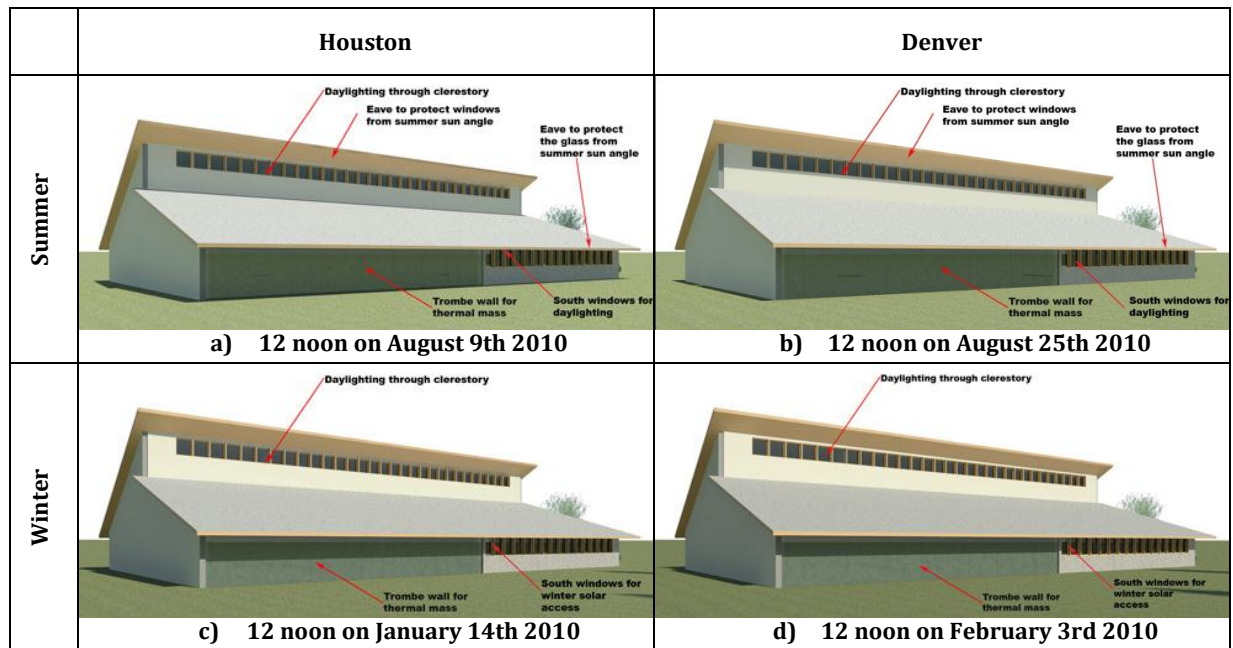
High Performance Building over the site with Tromb  Wall + South Windows + Clerestory
